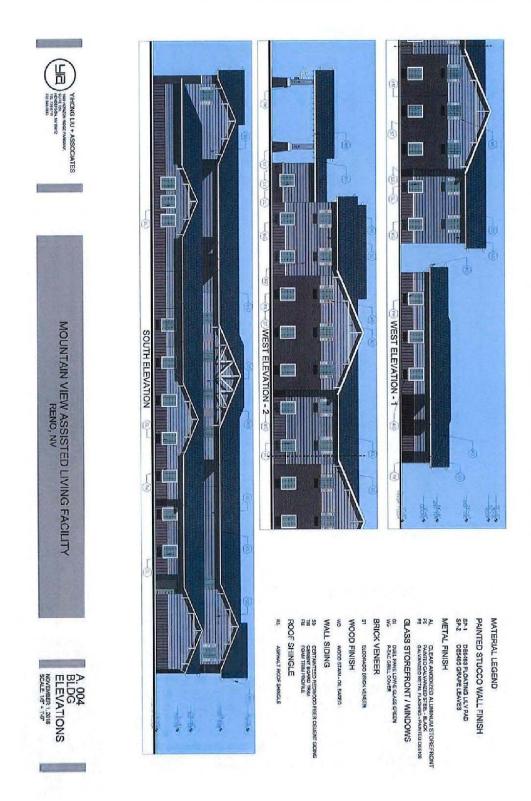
32 BED MEMORY CARE/82 BED ASSISTED LIVING BUILDING ELEVATIONS
